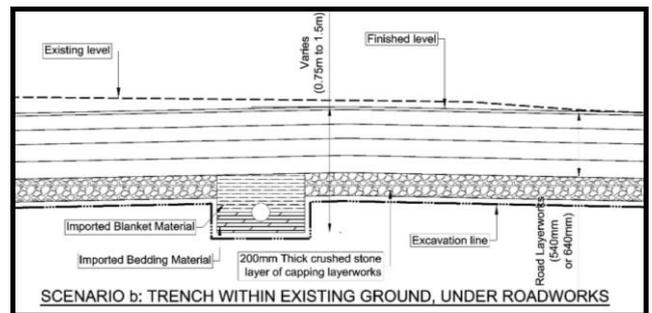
Scenario B: Services- Trench within existing ground (Under road works) (source: Walters, 2020)
